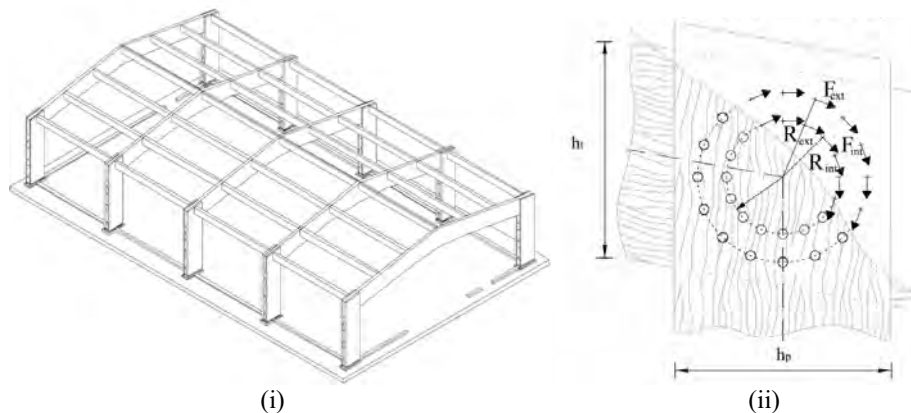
Illustration of the timber portal case study structures of Zonta et al. (2008) (i) perspective view of portal structure, and (ii) annular bolted moment resisting connection arrangement.
